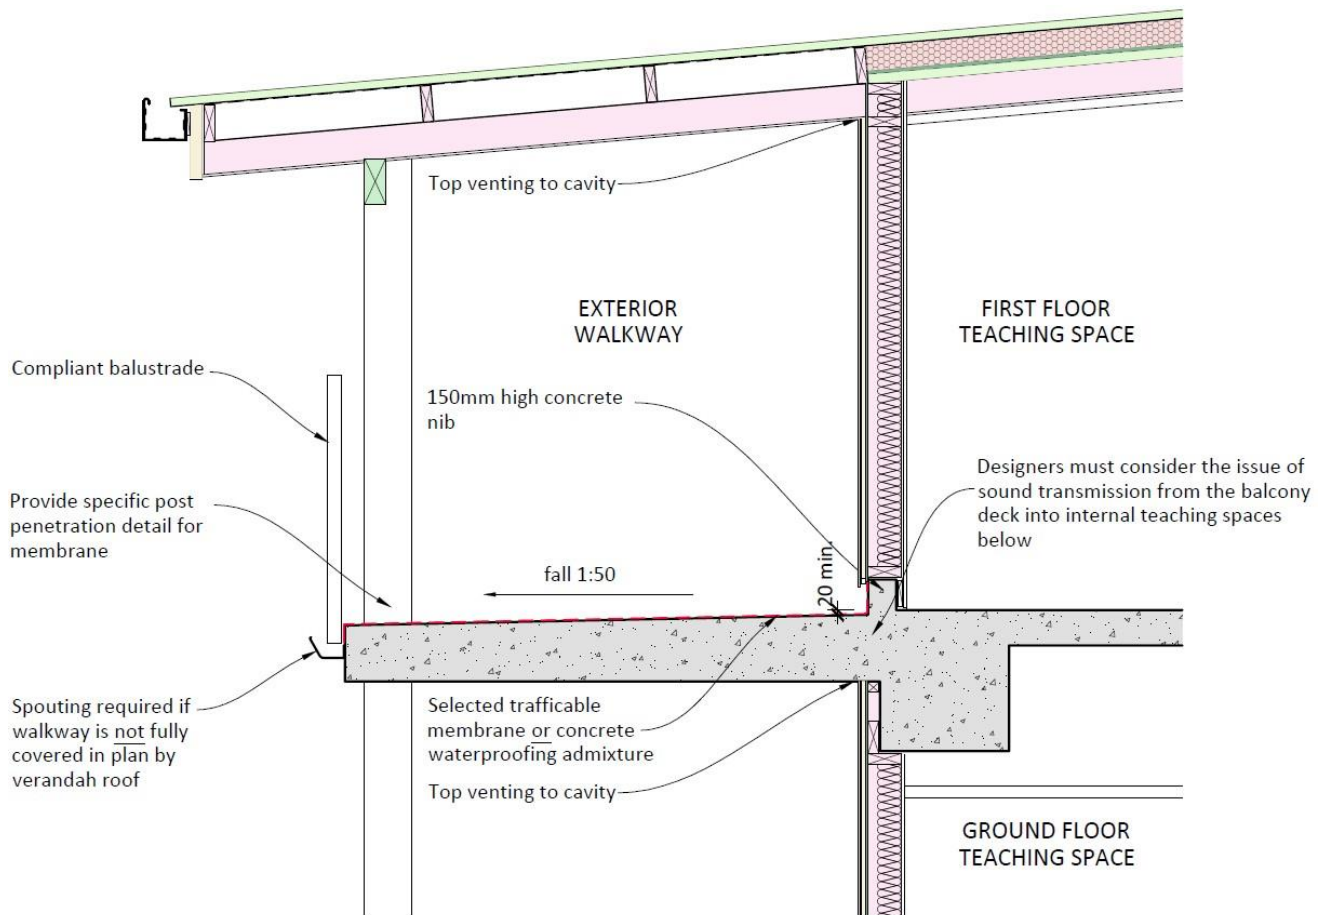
Waterproofing to Upper Decks – Trafficable Membrane or Waterproofing Admixture
